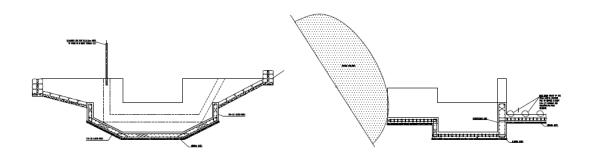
Typical Drawing of the Drop Structure (source: JET)
